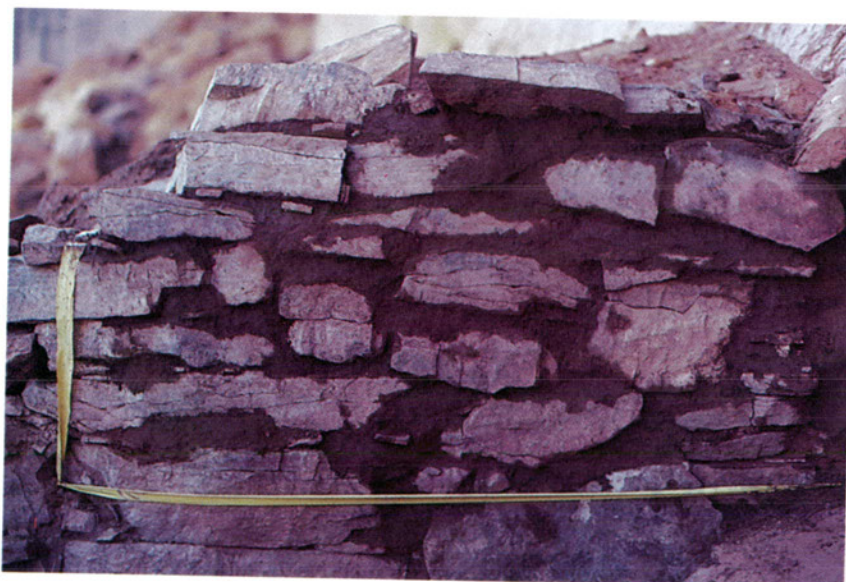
The west wall of Structure 1 after stabilization with a soil-calcium aluminate cement mortar.
